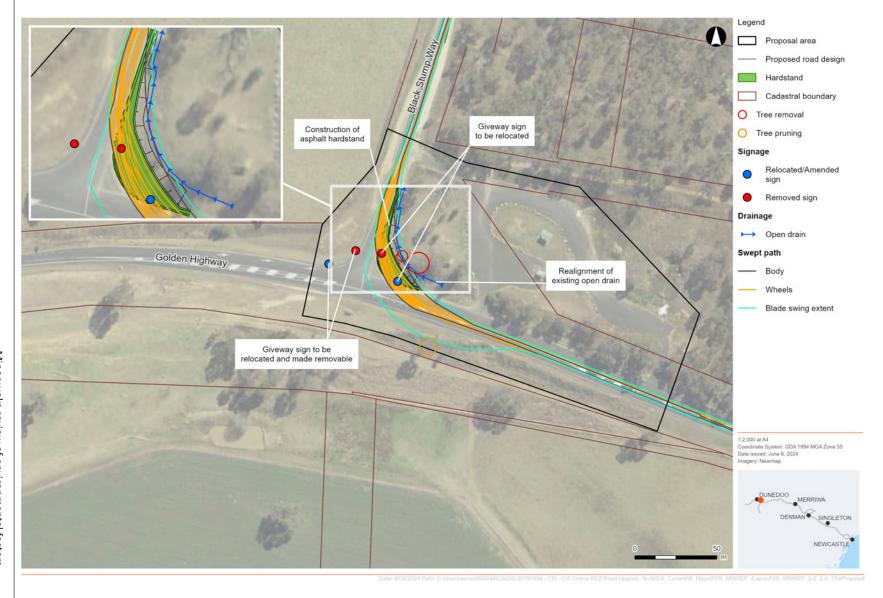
The proposal – Golden Highway and Black Stump Way intersection, Leadville (I-013)
